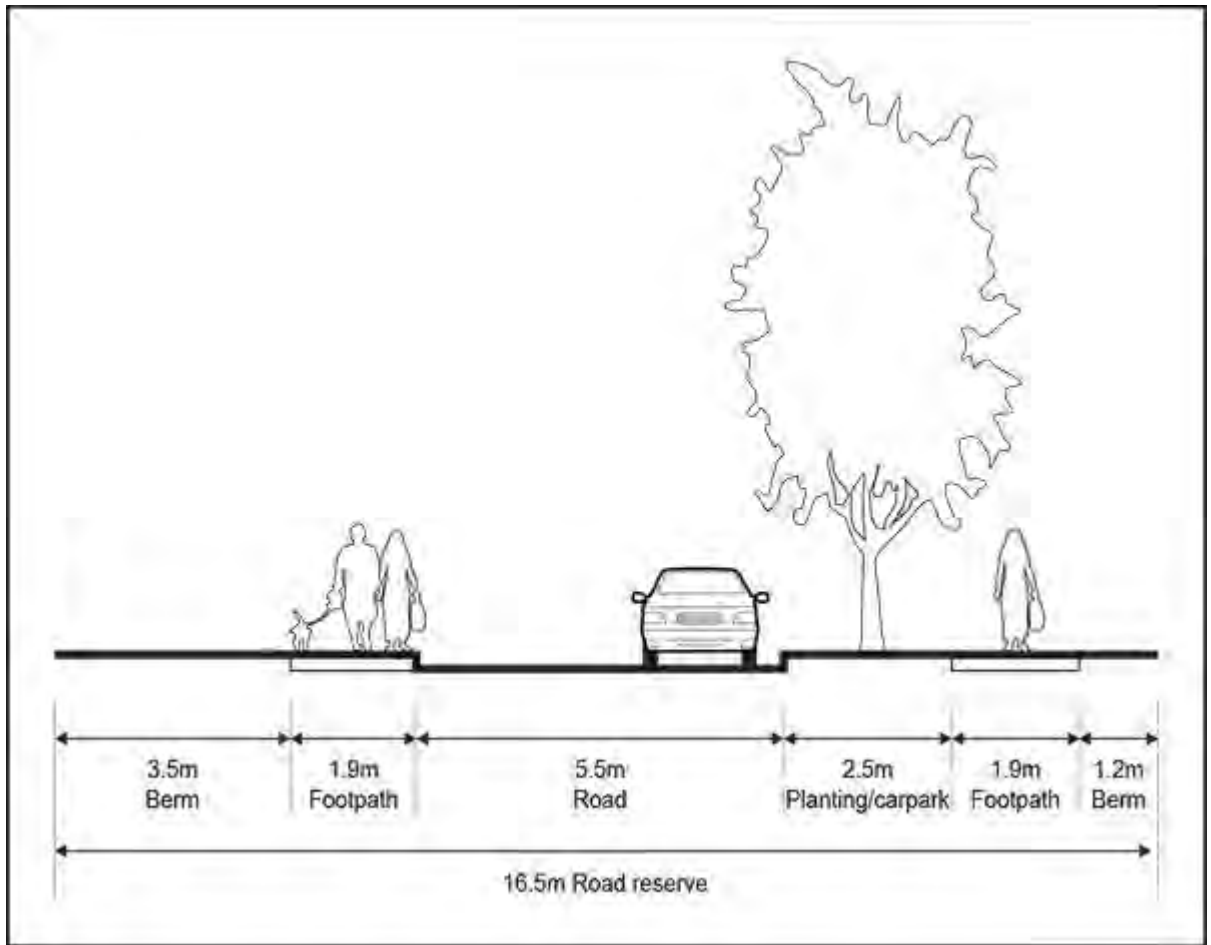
Indicative Street Section – Walpole Street extension between sub-precincts A and B (16.5m wide)
